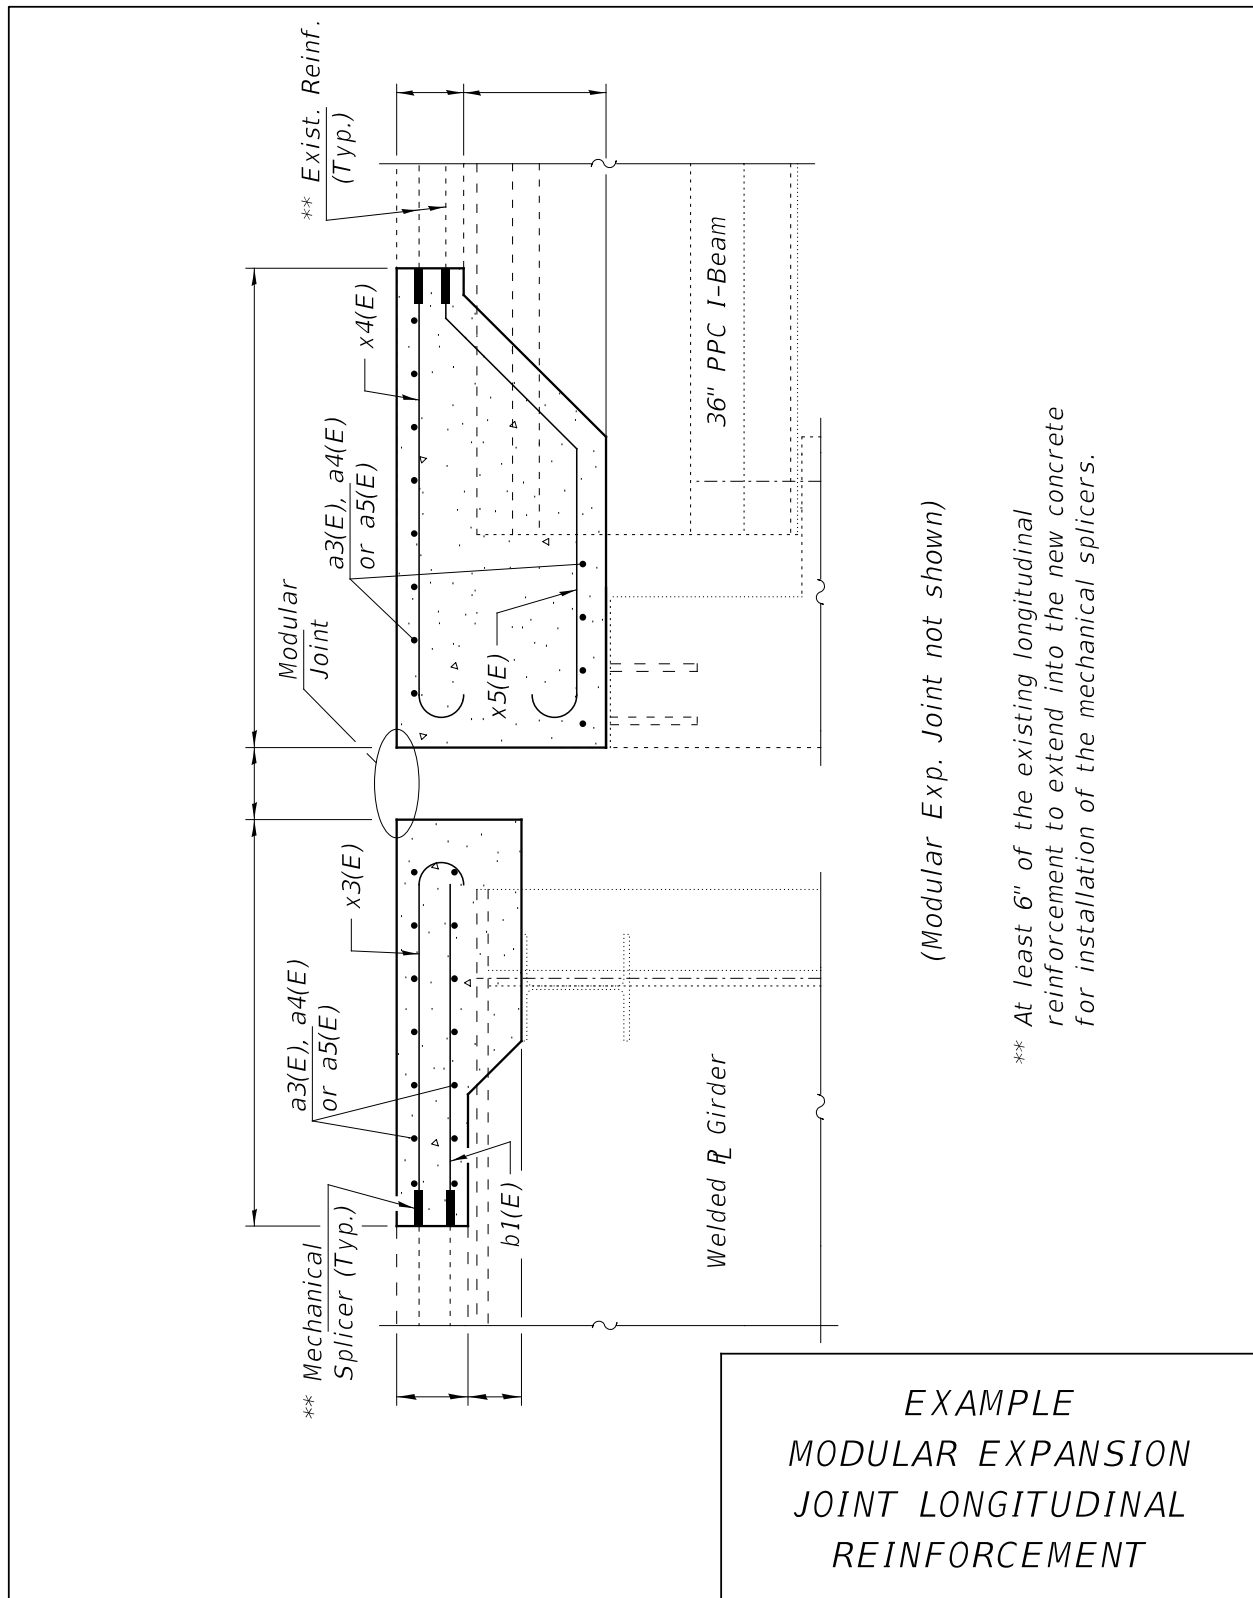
Example – Modular Expansion Joint Longitudinal Reinforcement
